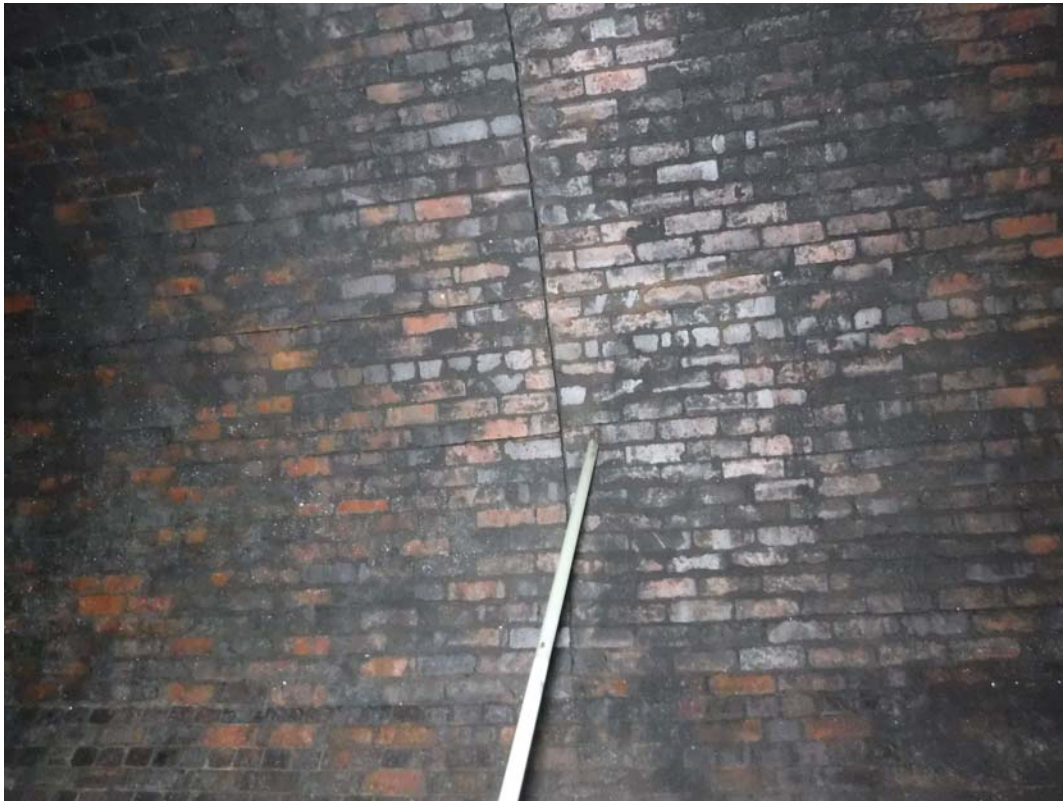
022+14 to 023+19 Haunch Up, Brickwork, multiple longitudinal bedding fractures, max. width 3mm.
